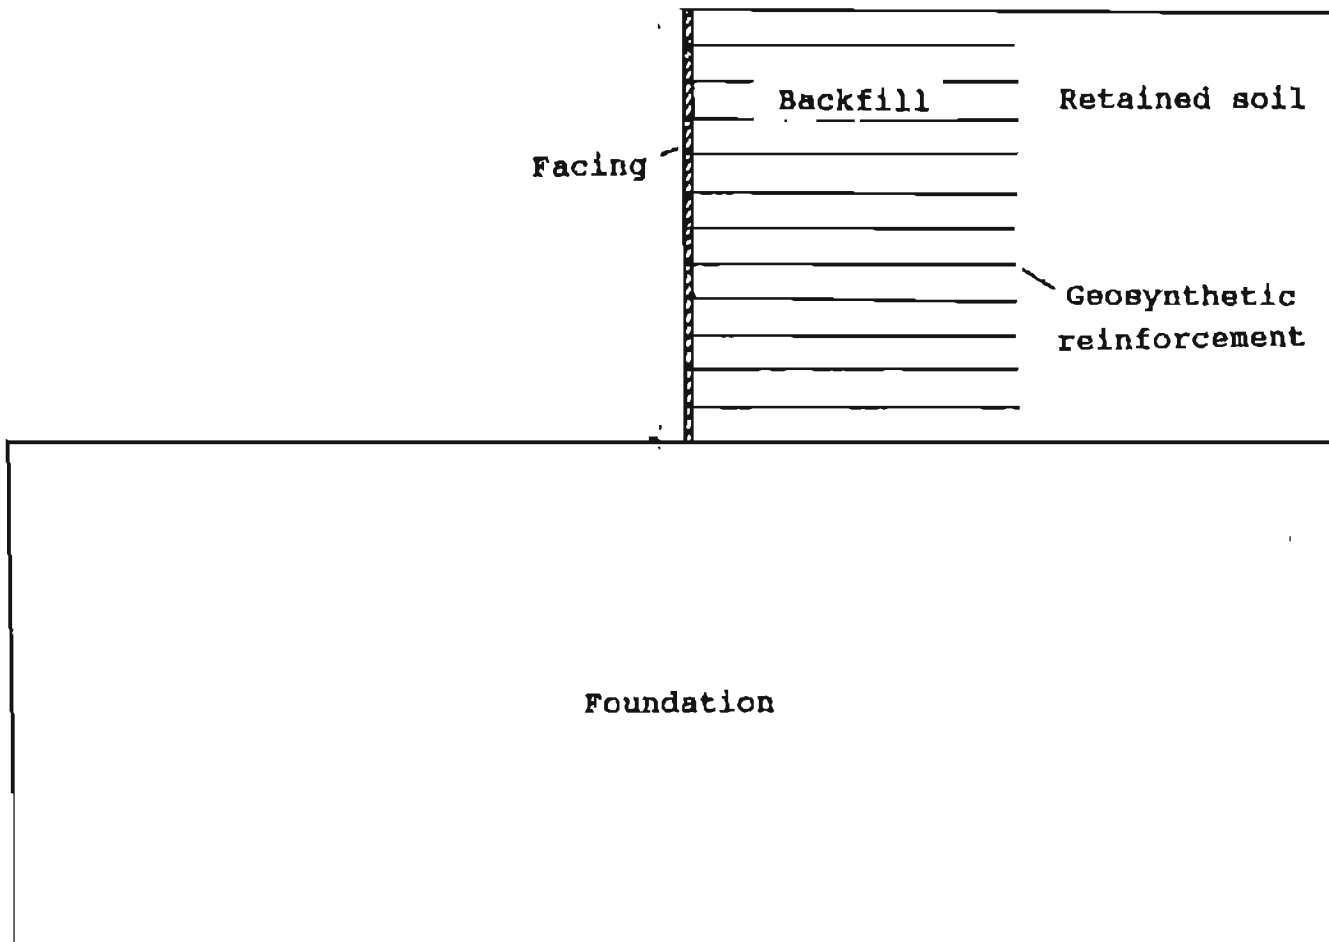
Components of a Geosynthetic Reinforced Soil Retaining Wall
